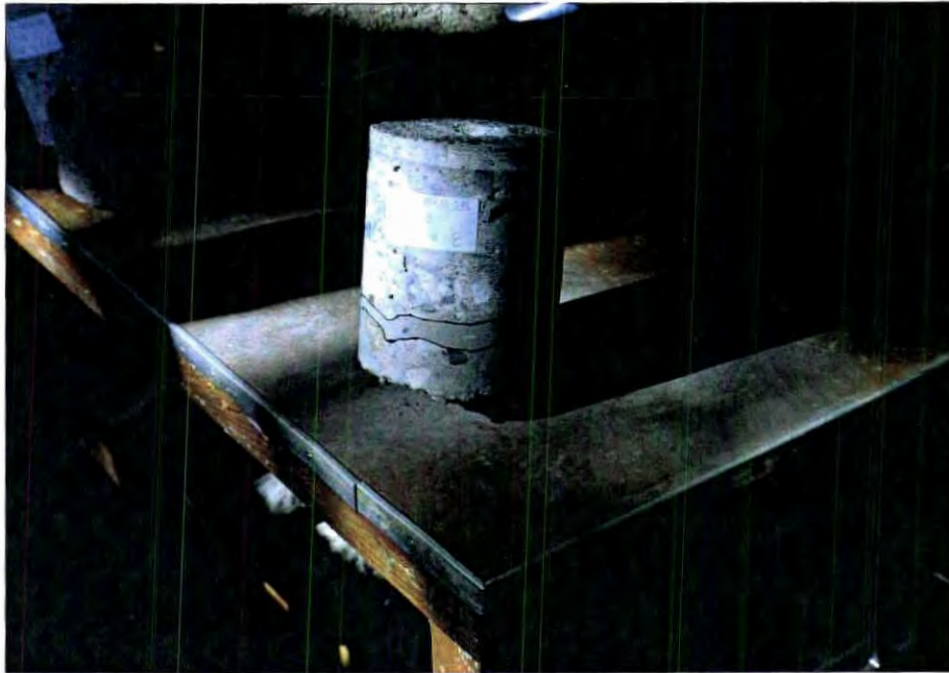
Grout Filling the Voids in the Concrete Slab in
